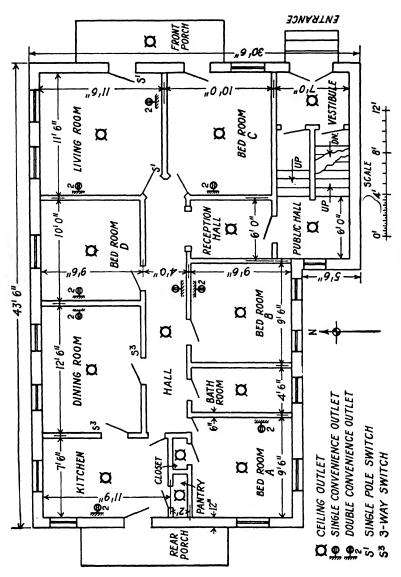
Floor Plan of Apartment Building, Showing Location of Electrical Outlets
